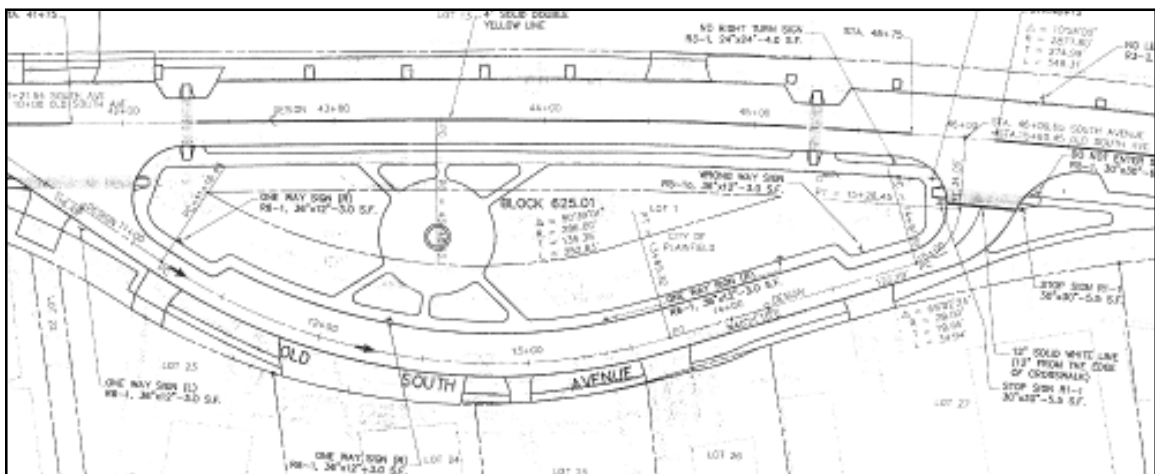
Plan at South Avenue and Old South Avenue.
